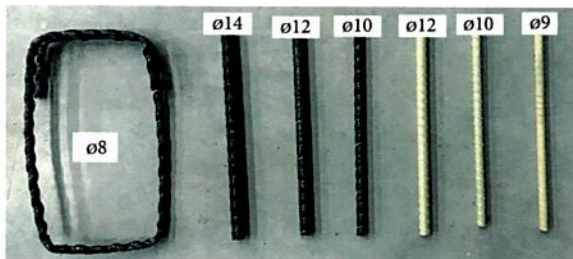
Samples of GFRP longitudinal and transverse reinforcement.
